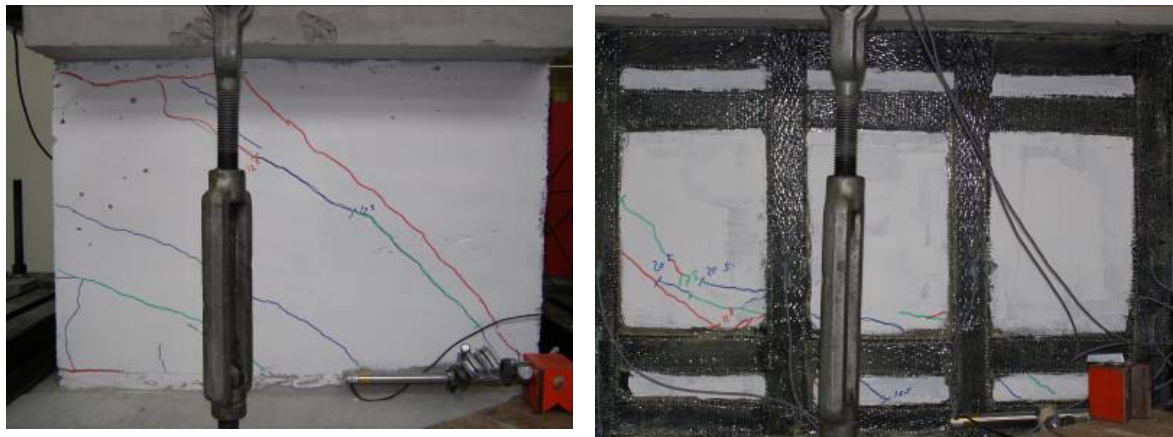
Specimen S1 & SR2 crack pattern at test end.
